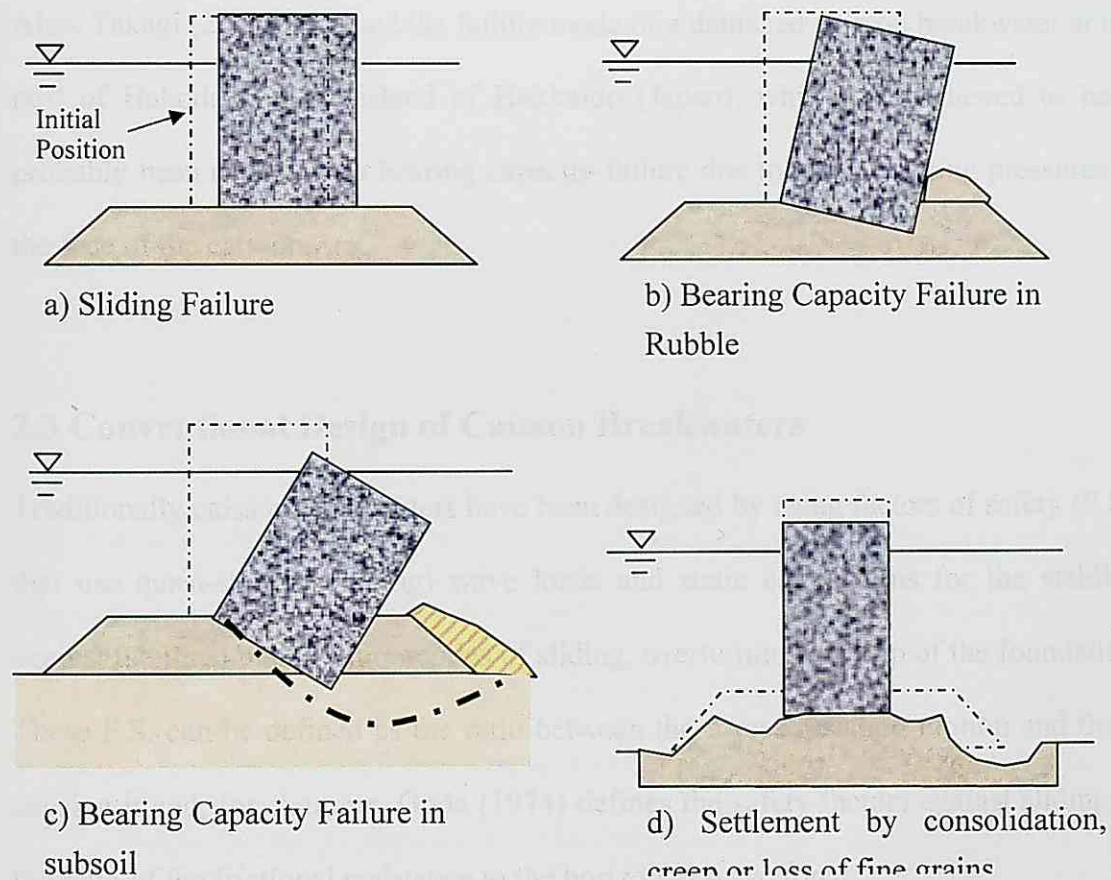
Illustration of Some Failure Modes of Caisson Breakwaters
